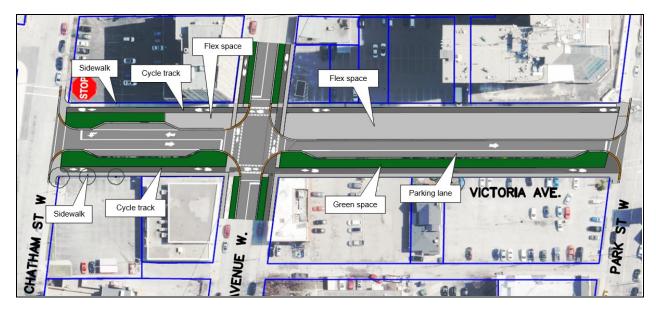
Victoria Avenue Recommended Design (Chatham Street West to Park Street West)
